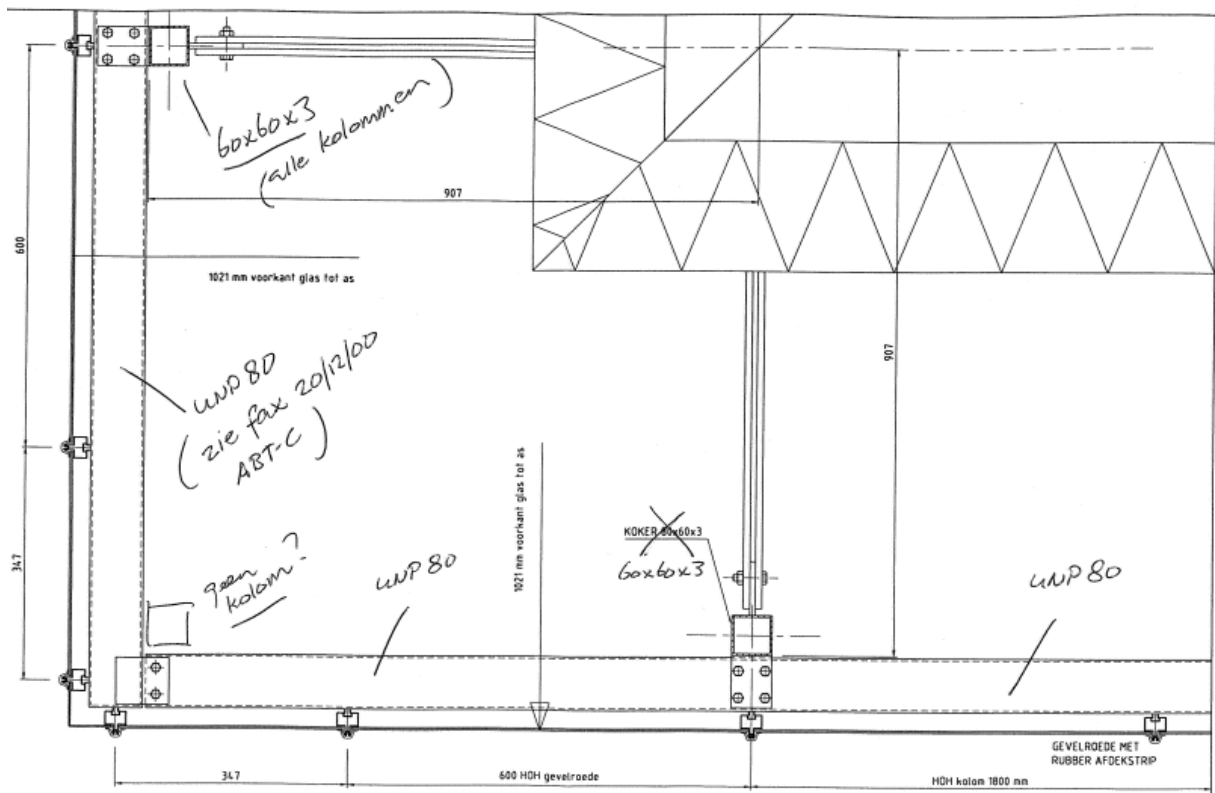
Plan view of the double-skin facade system, Source: (ABT bv, 2019)
